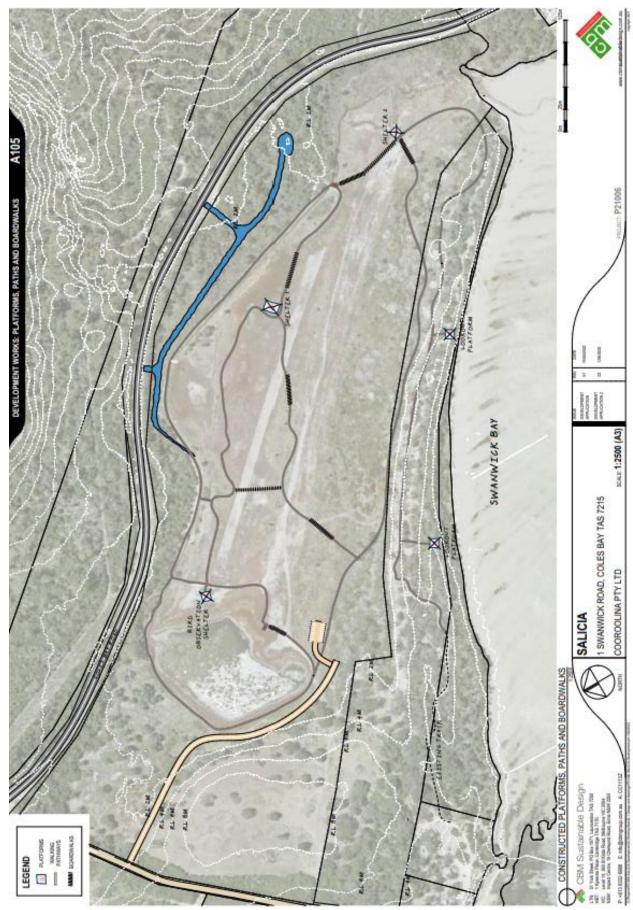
Proposed Constructed Paths, Boardwalks and Platforms
